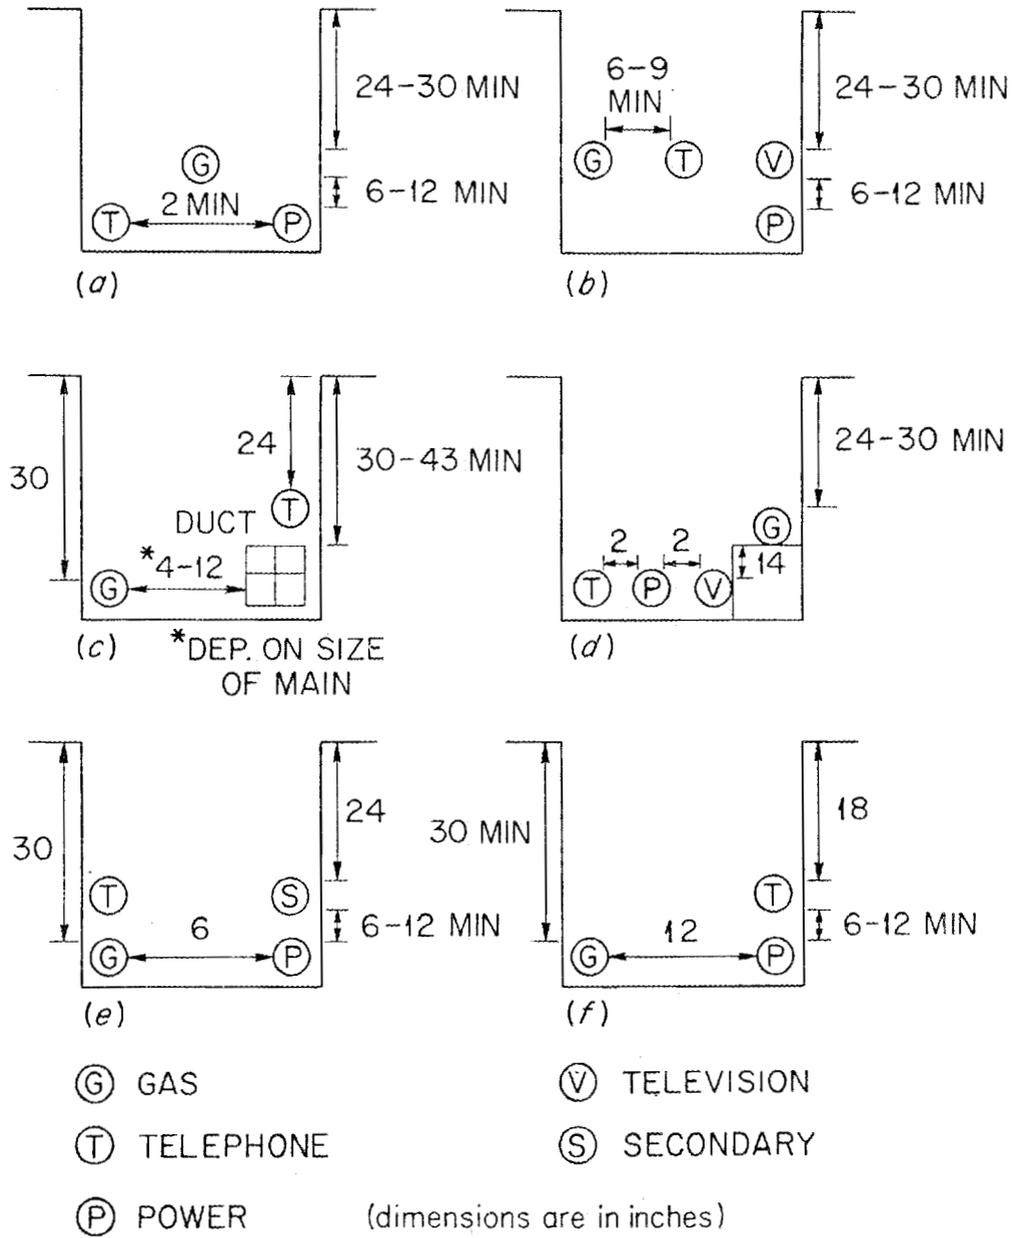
Typical Examples of Installations in Common Trenches²⁵
